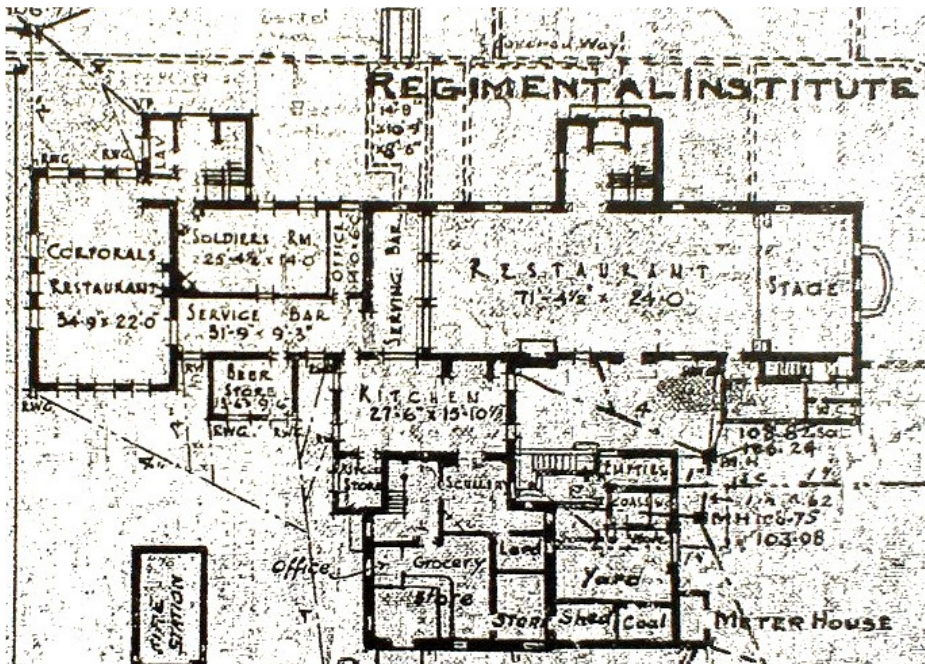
Extract from 1946 plan showing the original function and layout of the ground floor of the 1938 extension to HYD 11 (EHA 95/1578).
